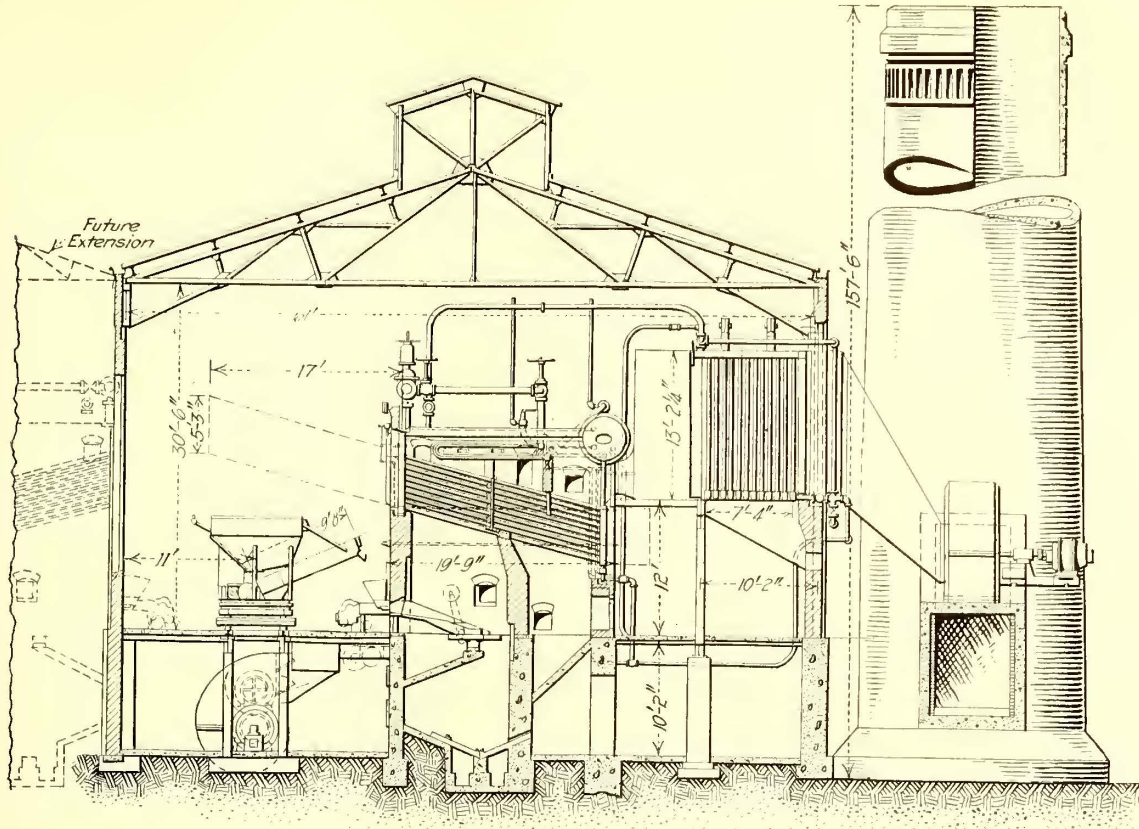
CROSS-SECTION OF BOILER ROOM SHOWING ARRANGEMENT OF EQUIPMENT AND SCHEME FOR EXTENSION
